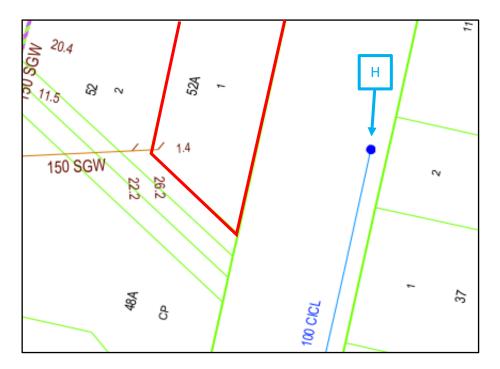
Section Sydney Water Reticulated Mains Water Supply Layout Plans
